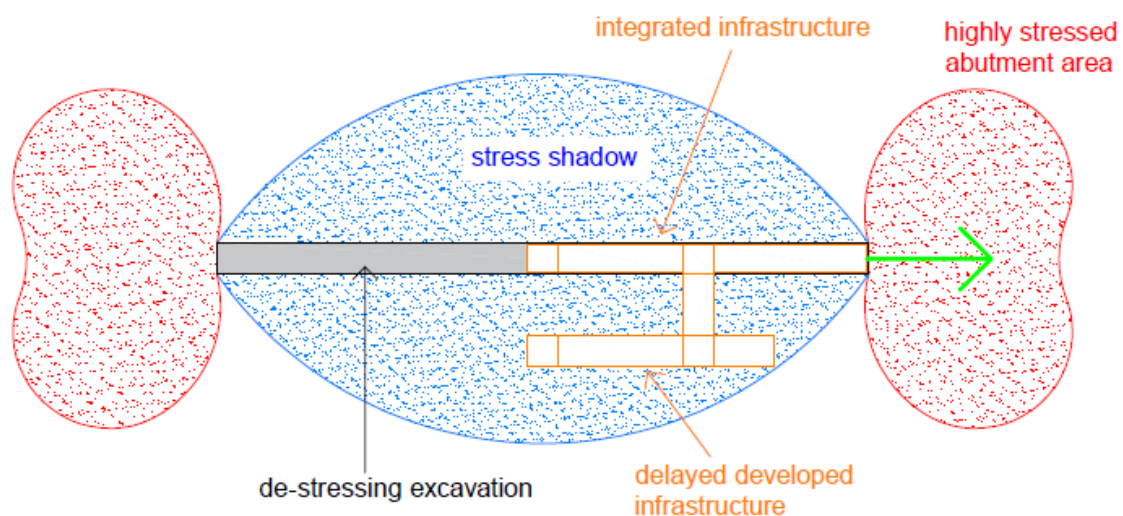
Vertical cross-section showing the principal layout of de-stressing excavations developed from infrastructure, which is integrated in de-stressing excavations or which is developed delayed; the green arrow shows the direction, in which the de-stressing excavation is advanced.
